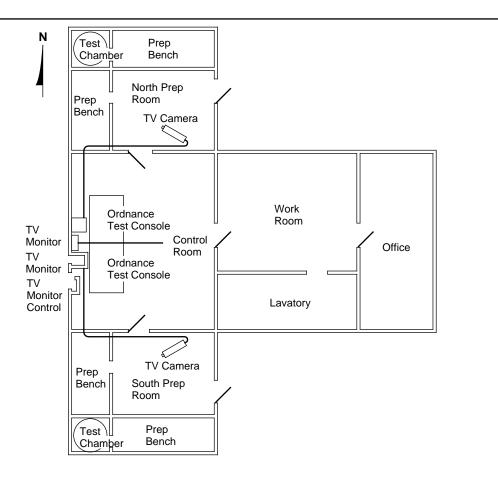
Electrical-Mechanical Testing Facility Floor Plan
